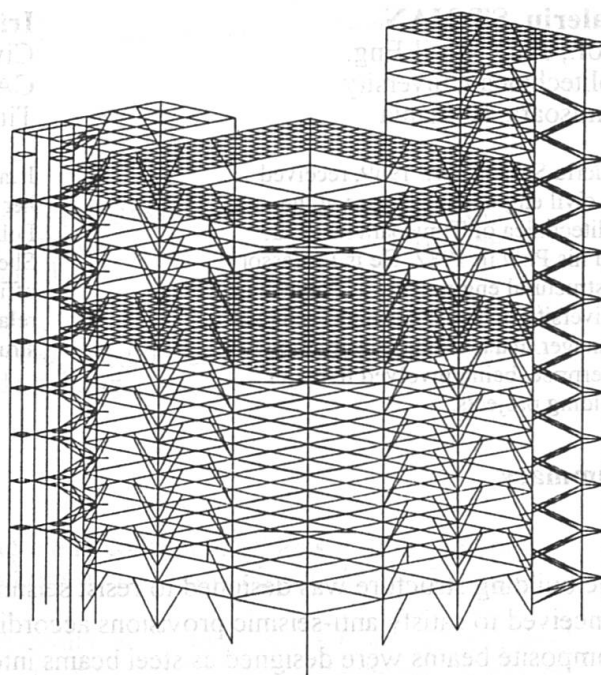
Front view of the multi-storey building Fig. 2 The space bar model of the structure
